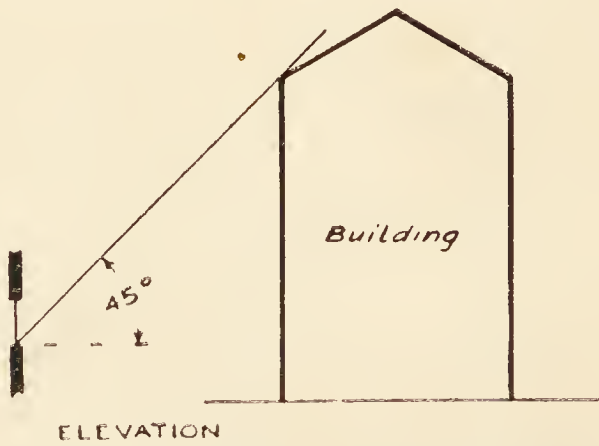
Elevation of building showing vertical angle of obstruction.
